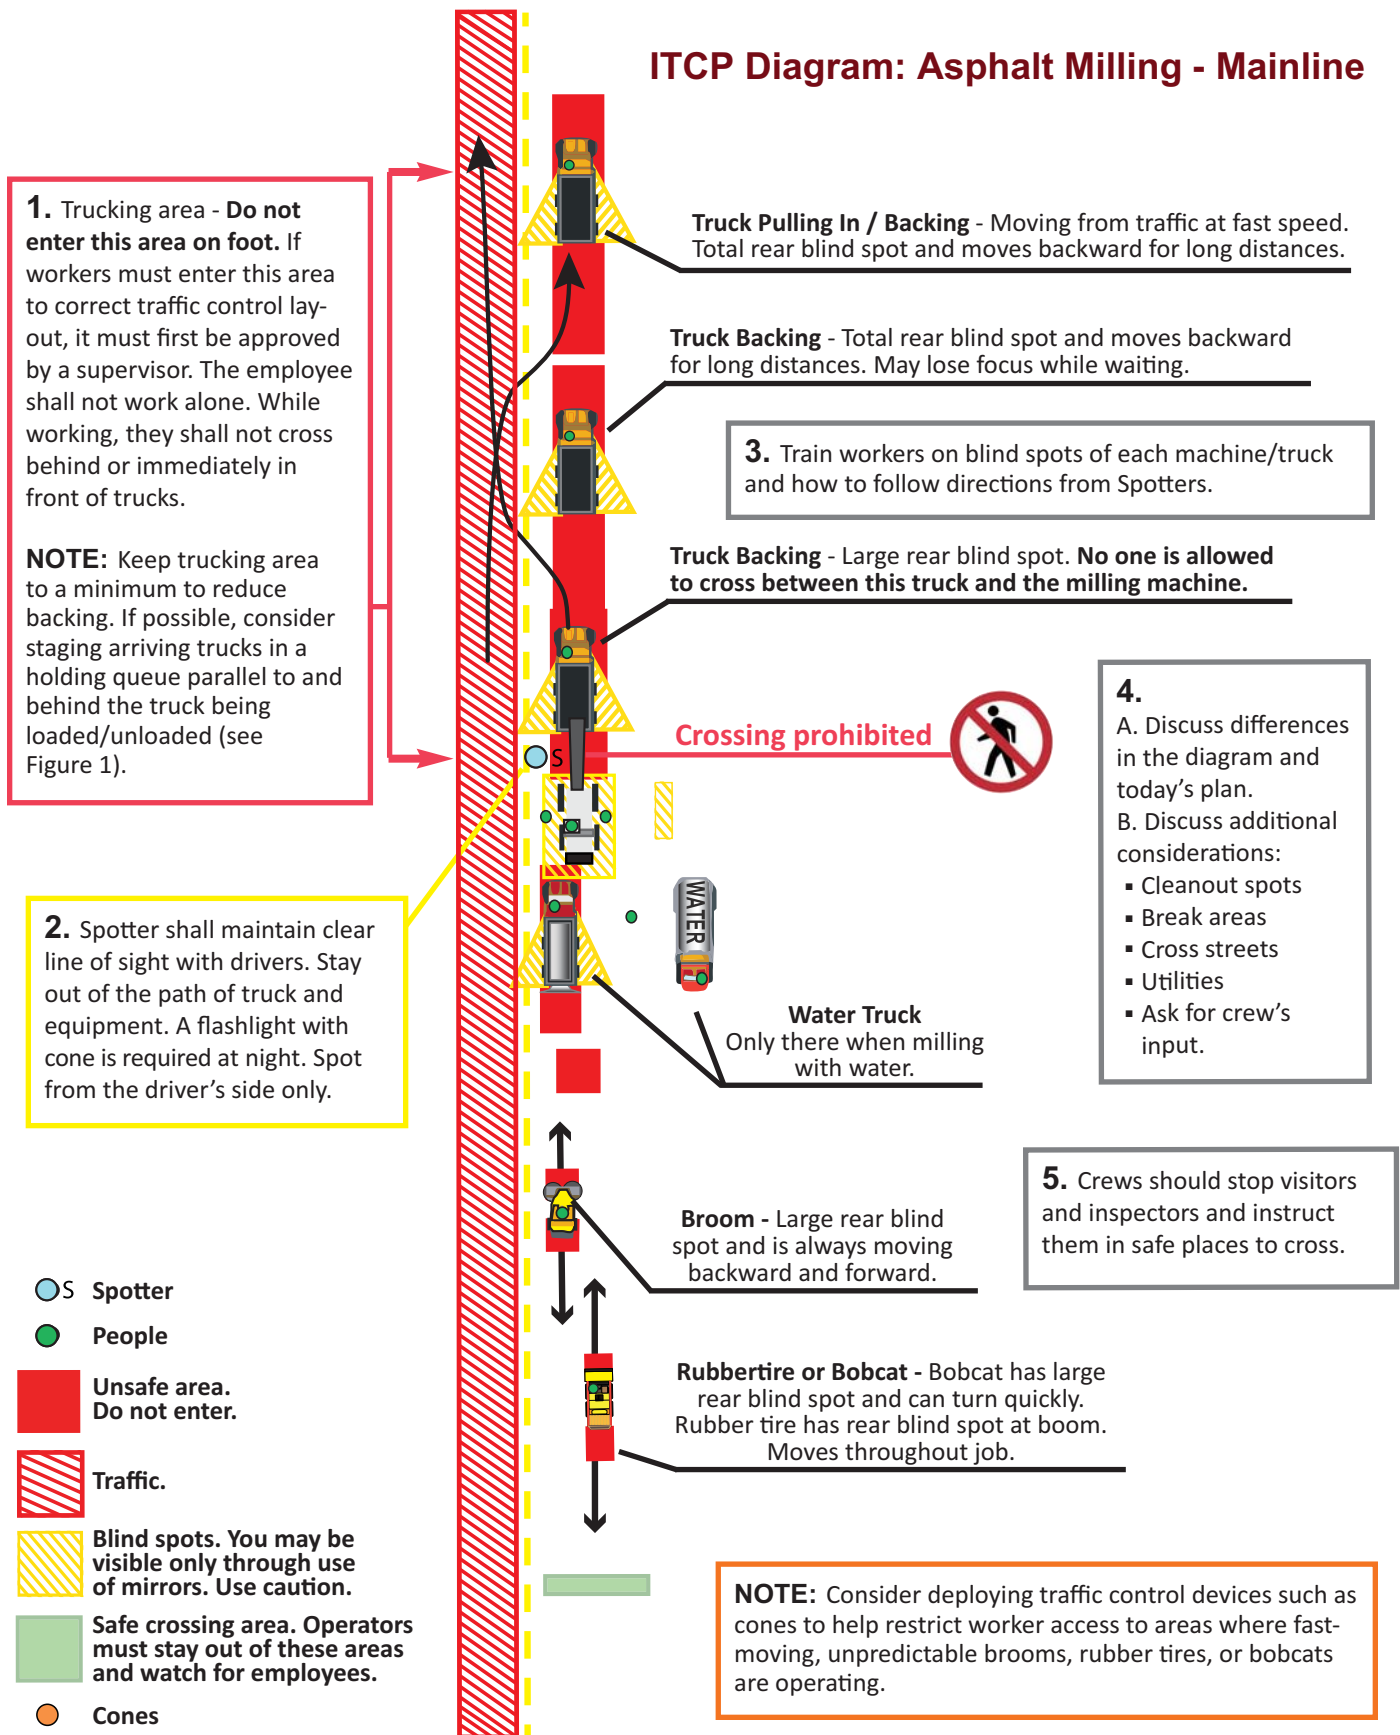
Example diagram of vehicle, equipment, and worker locations and movements for asphalt milling mainline (Source: Adapted from Barriere Construction, Safe Zones, 2014)⁶
